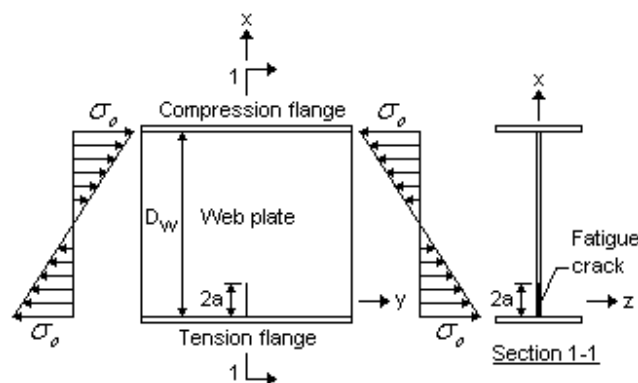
I-shaped beam or plate girder under pure bending showing location of through-thickness fatigue edge-crack within web plate
